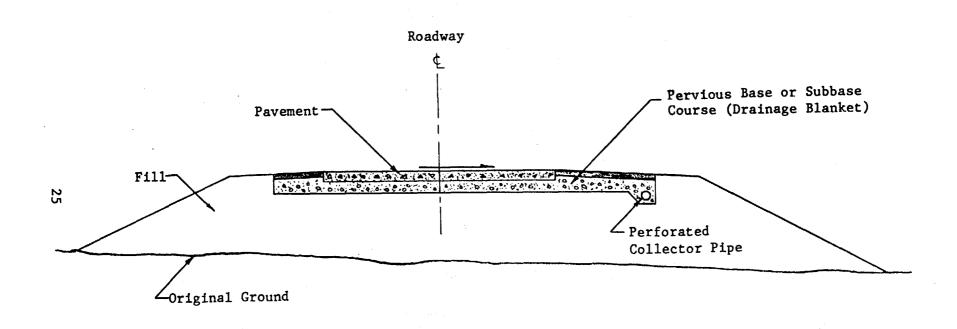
Longitudinal Collector Drain Used to Remove Water Seeping Into Pavement Structural Section.
